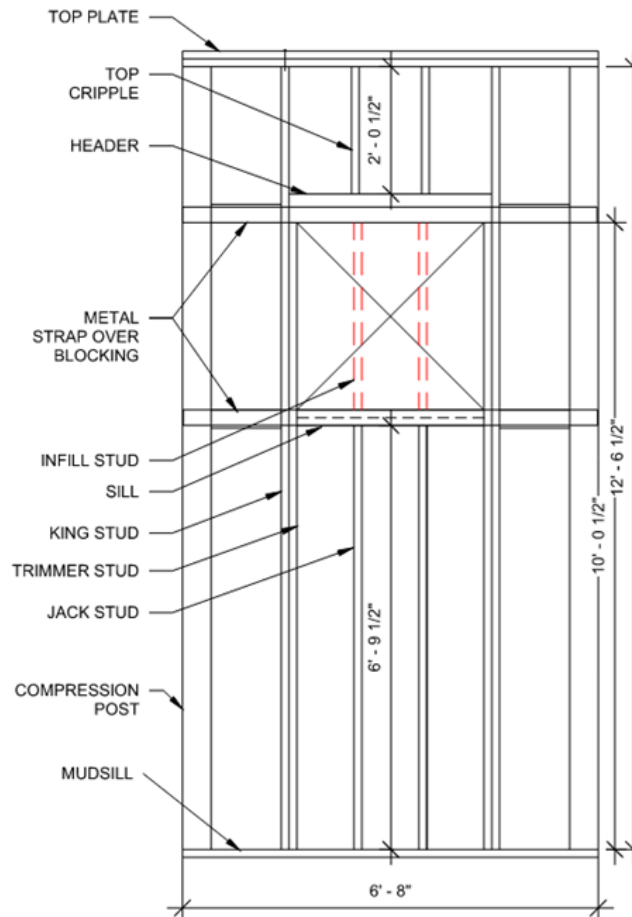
Segmented and FTAO Timber Shear Wall Designs
